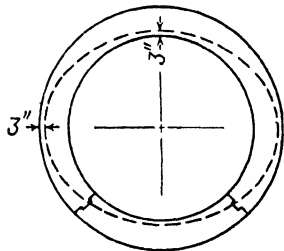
General location of reinforcing steel for tension in soft-ground tunnel lining.
